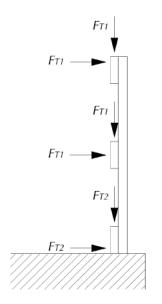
Serviceability loads, alternative 1 Loads acting separately
